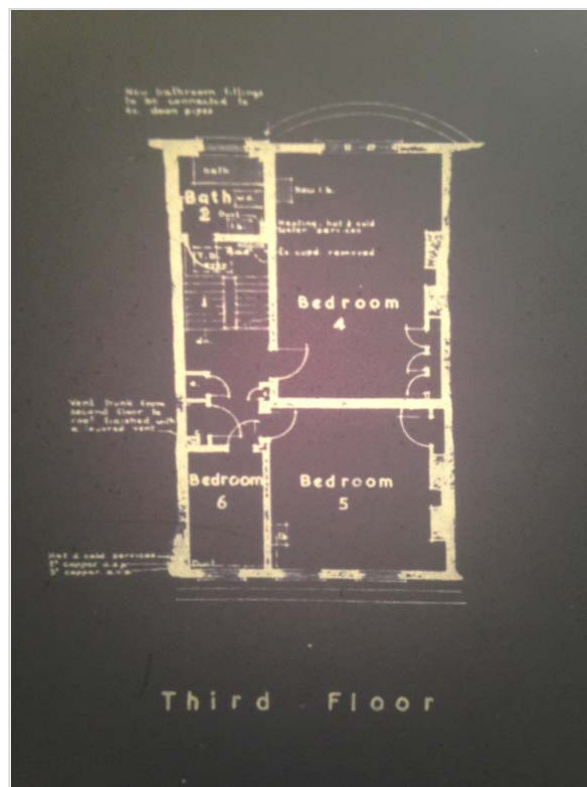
1950s Drainage Plan (Third Floor)³¹
